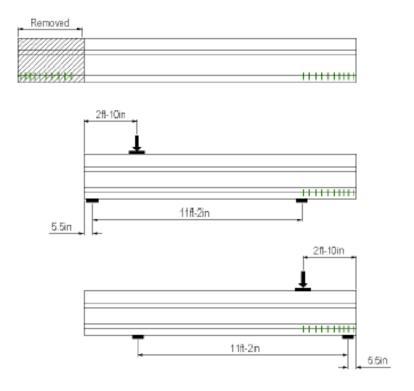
Specimen Fabrication and Test Setup (Ross 2010)
